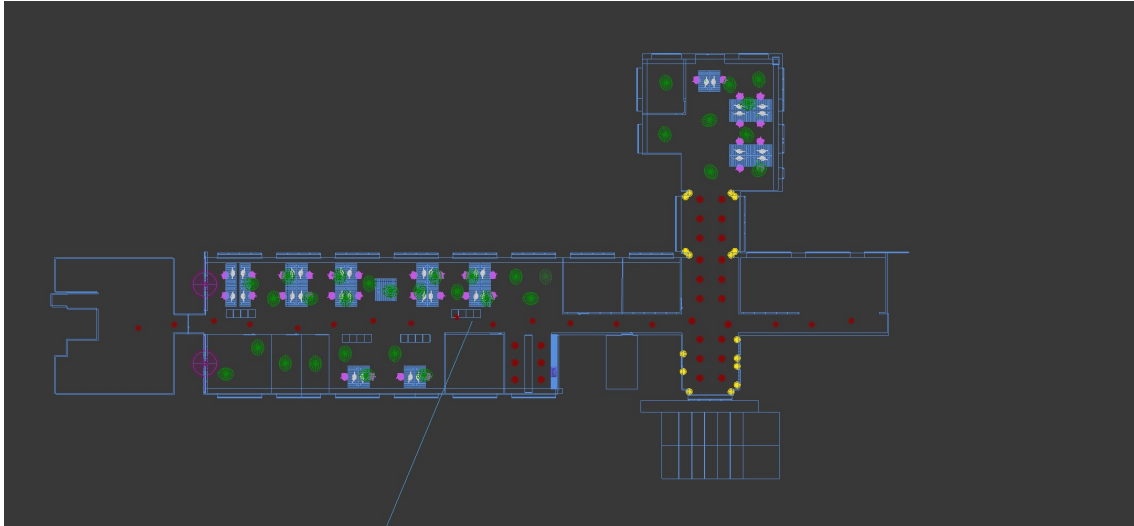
A floorplan of the third floor of the IDA office. showing the placement of luminaries for the new lighting design.
